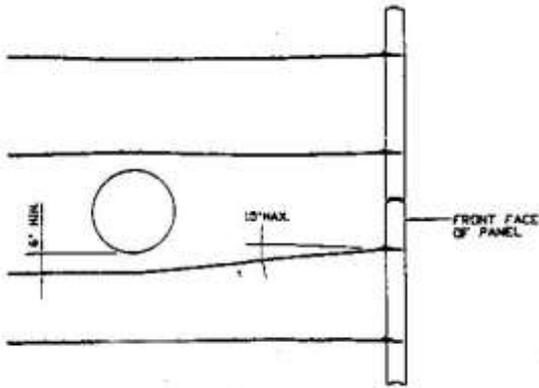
H.15 Soil Reinforcement going under a Horizontal Obstruction
